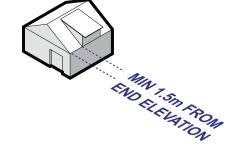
To manage scale, dormers should be sloped and be set back from the end elevation.
